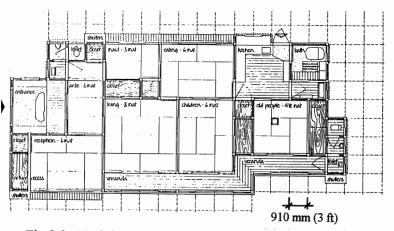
Modular System in Japanese house (Engel, 1985).
